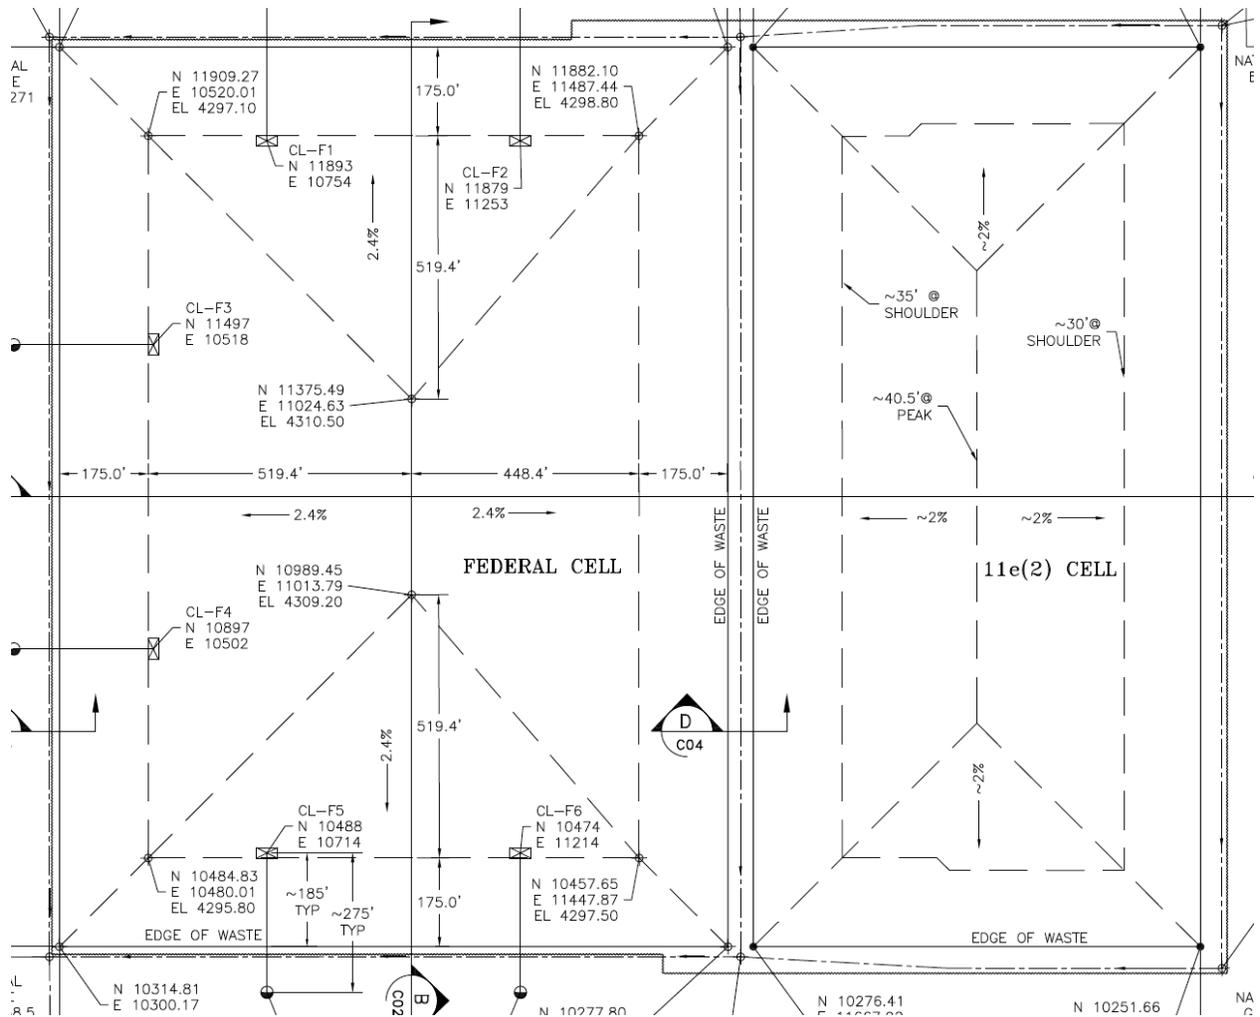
Former (2020) Federal Cell footprint (from drawing 14004-C-01, rev. 0).
